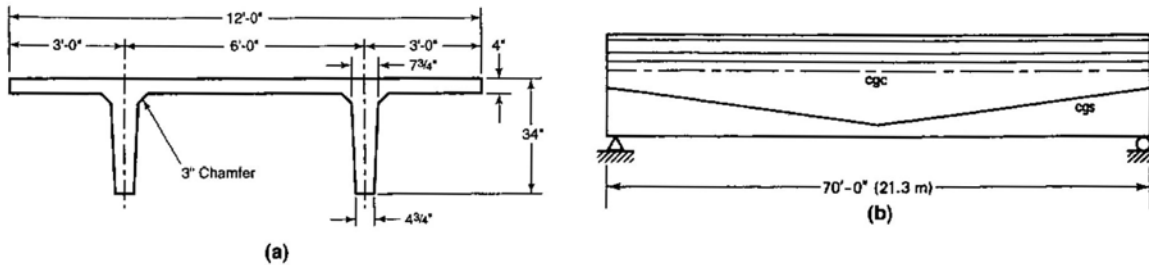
Beam geometry in Example 5.5. (a) Section. (b) Elevation.
